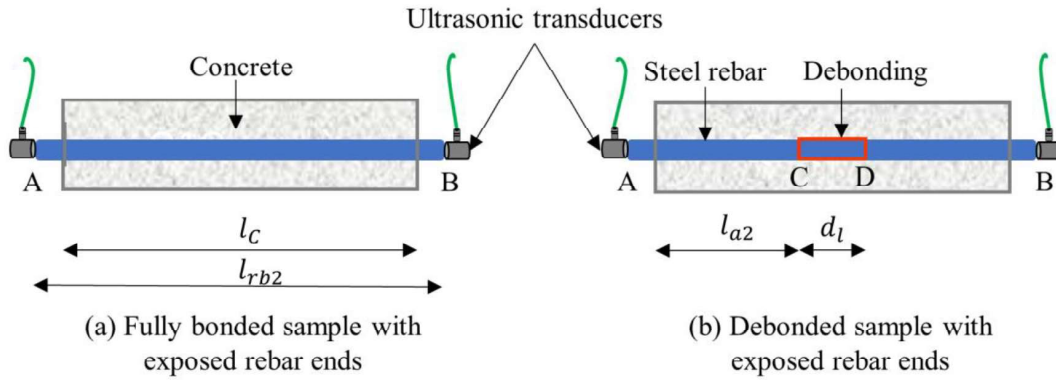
(a) Fully bonded and (b) debonded specimen with exposed rebar ends for heat damage study
